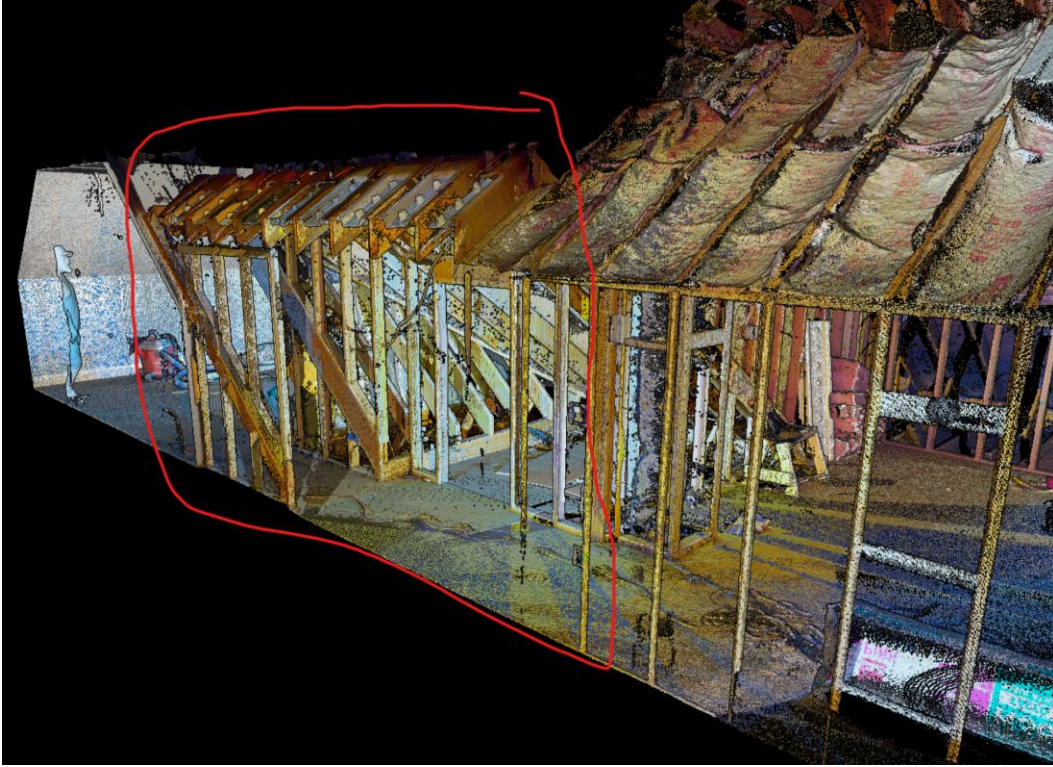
Attic Access Hallway Framing (Point-Cloud Longitudinal View)
